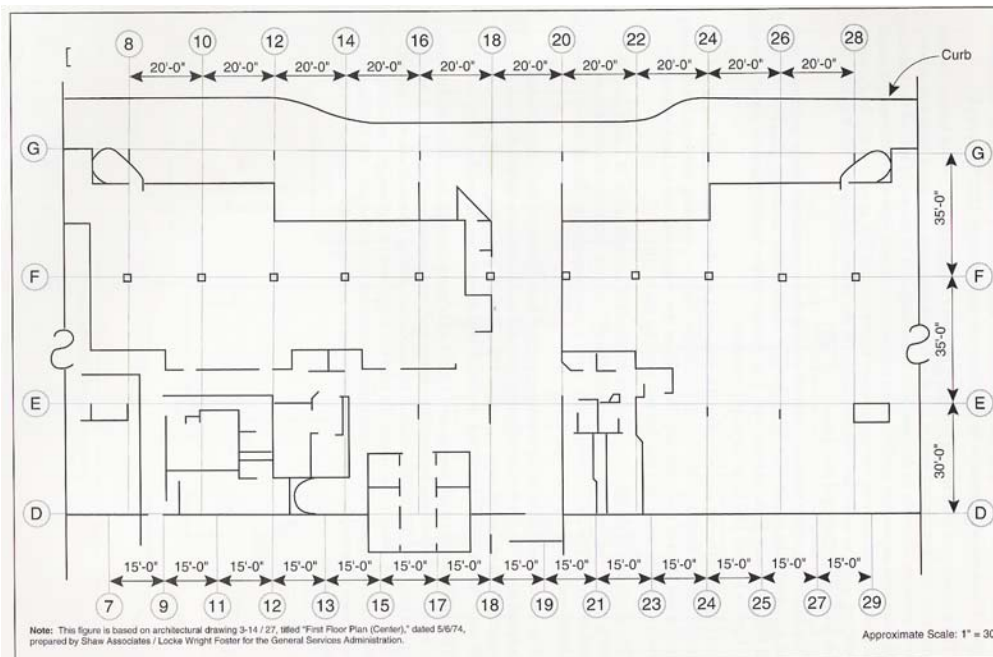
First Floor Plan Of Murrah Building (FEMA 1996)
